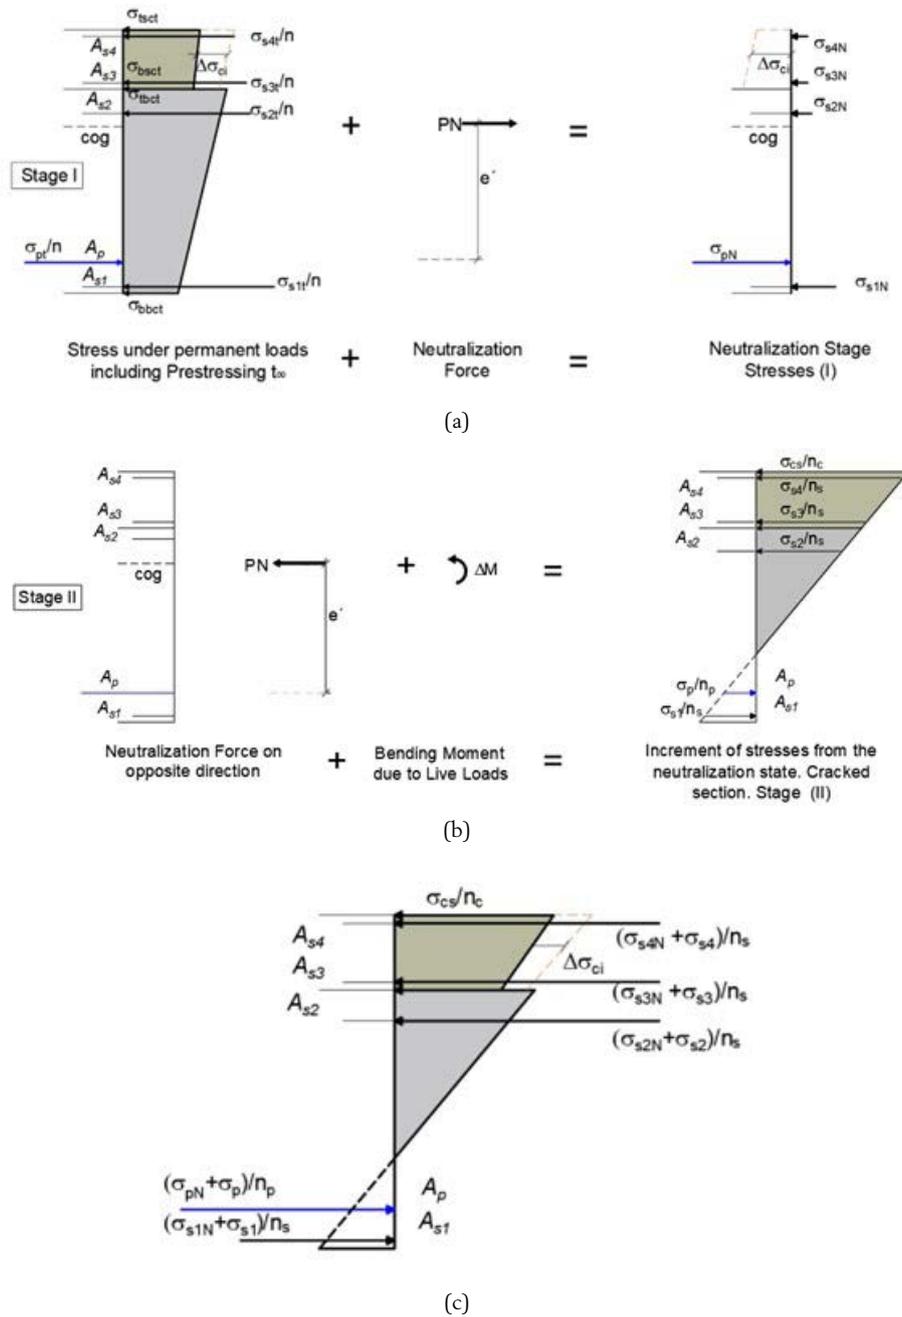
Composite section at midspan regions subjected to positive bending moment with cracking of the precast beam. (a) Stage I: Neutralization of permanent concrete stresses at the precast beam. (b) Stage II: Increment of stresses from neutralization state due to application of neutralization forces in opposite direction and live loads. (c) Total Stresses: Stages I + II.
